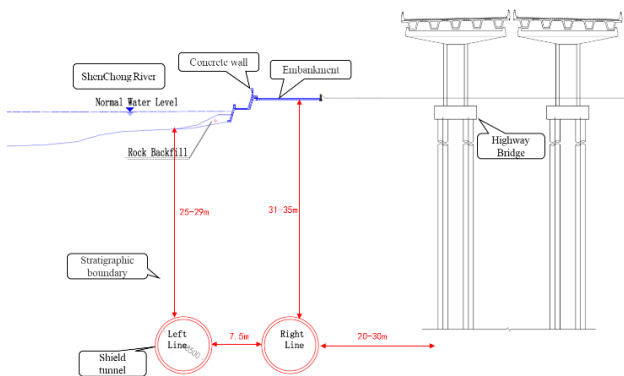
Typical cross-sectional view of the tunnel undercrossing the river embankment
